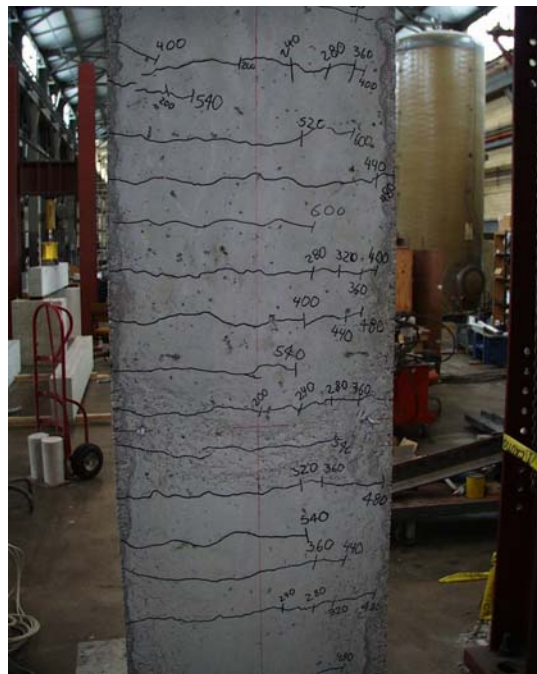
Specimen P6: Photo of South Wall at End of Test
